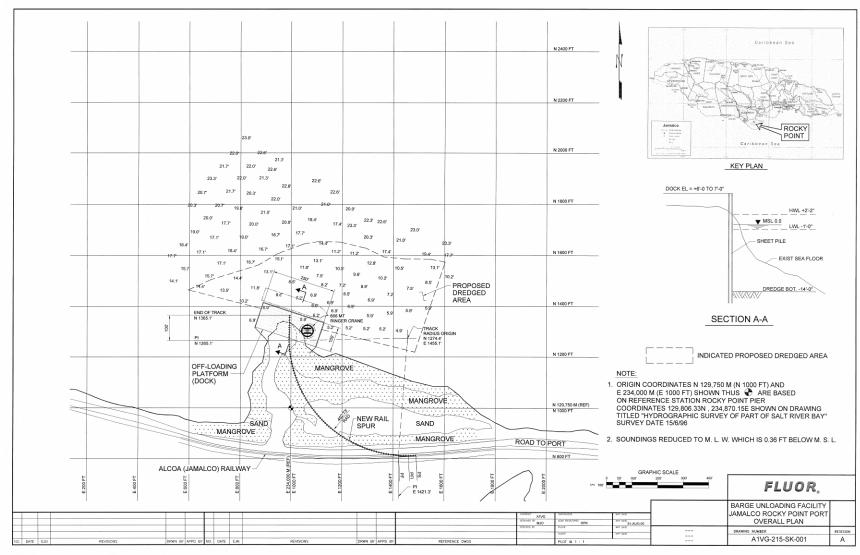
BARGE UNLOADING FACILITY, JAMALCO ROCKY POINT PORT PLAN
